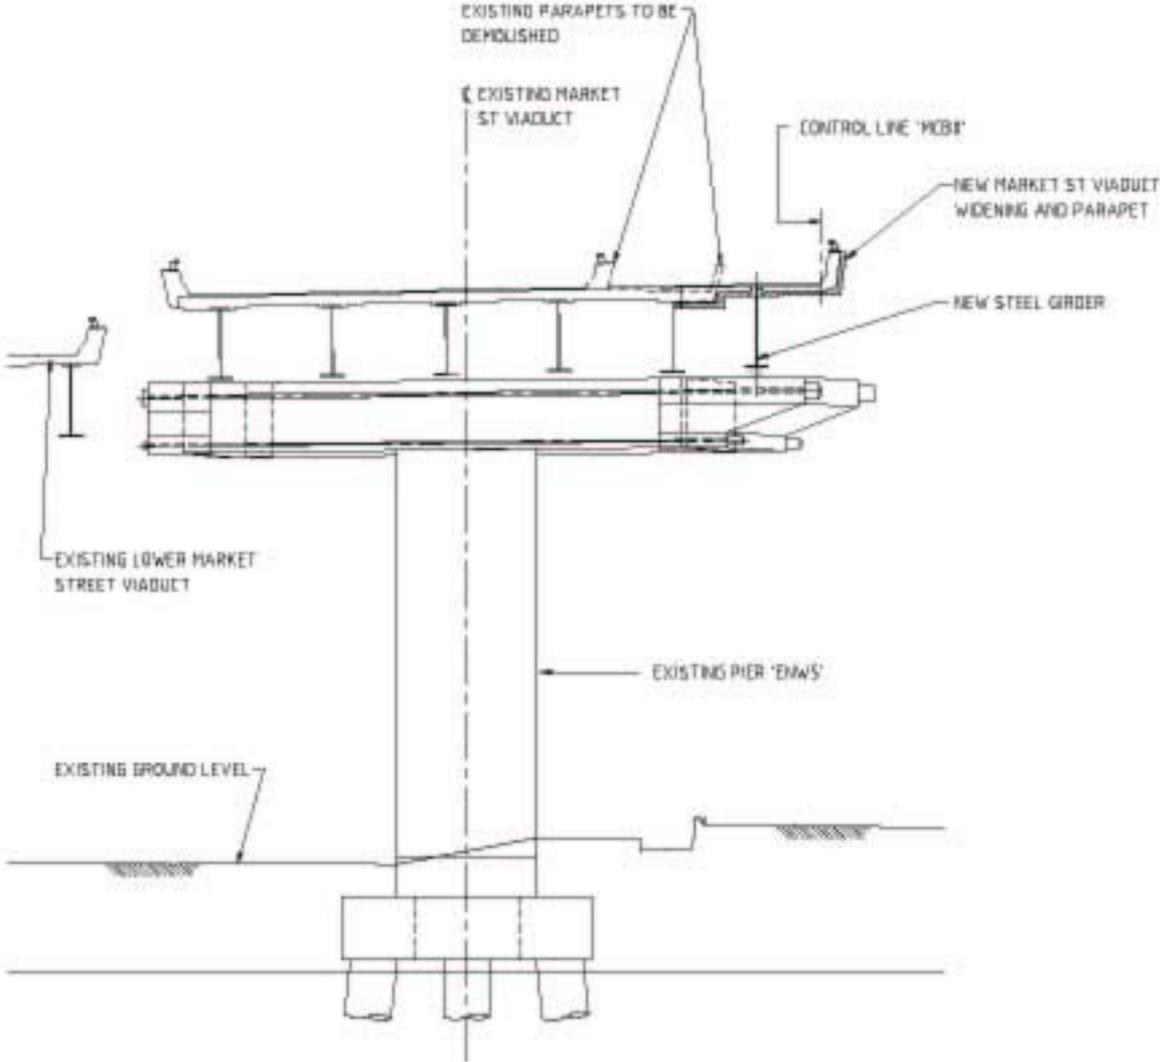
Elevation of Market Street Viaduct Widening at Steel Girder Spans
